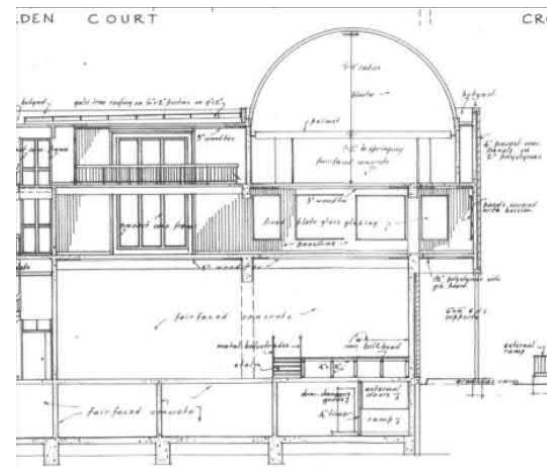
Detail of a sectional working drawing showing Roger Duff Wing with planetarium (removed 1995) (Source: Canterbury Museum)
